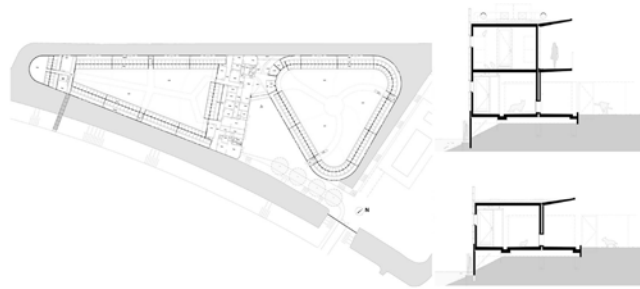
The Animal Refuge Centre, building ground floor plan and sections (Image courtesy of Arons en Gelauff Architecten).
